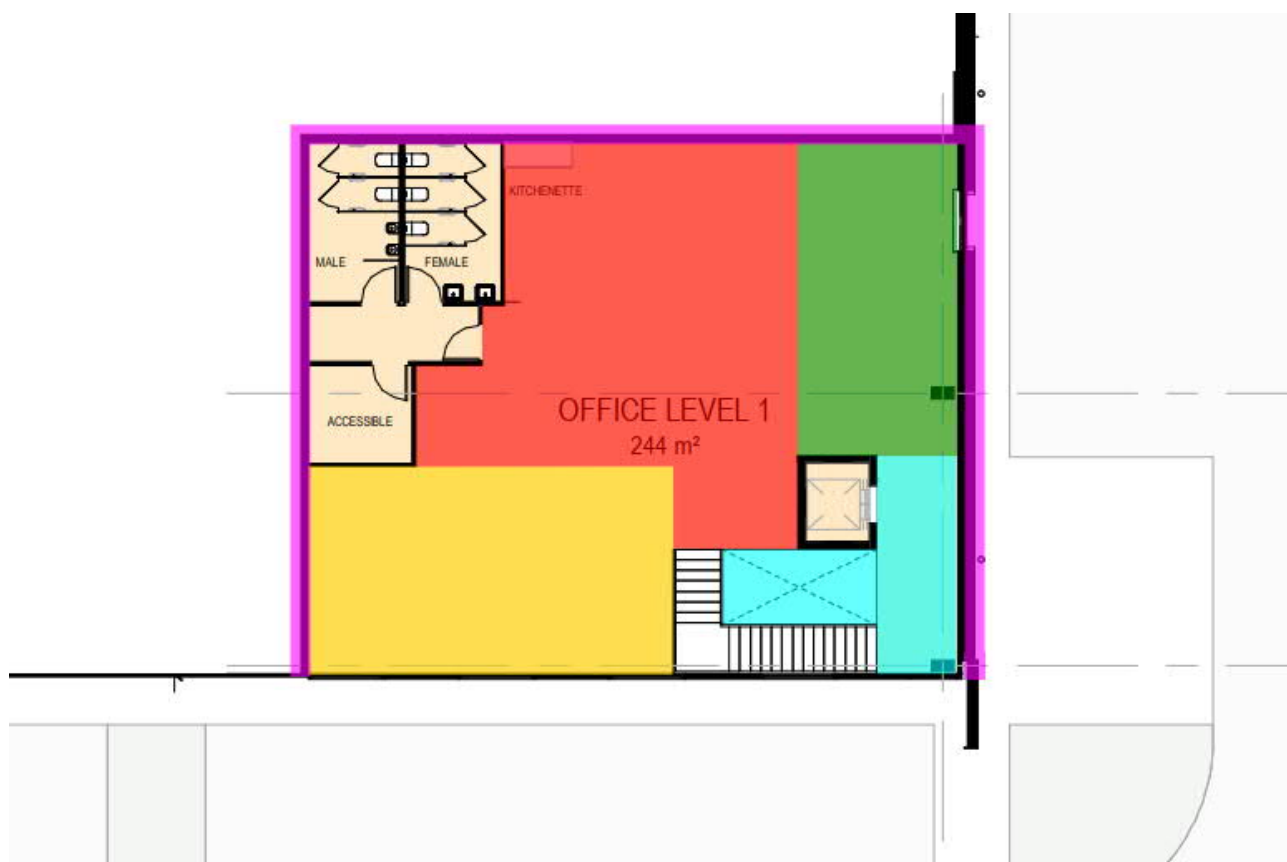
HVAC zones & thermal envelope for 10 McLaren Drive First Floor
